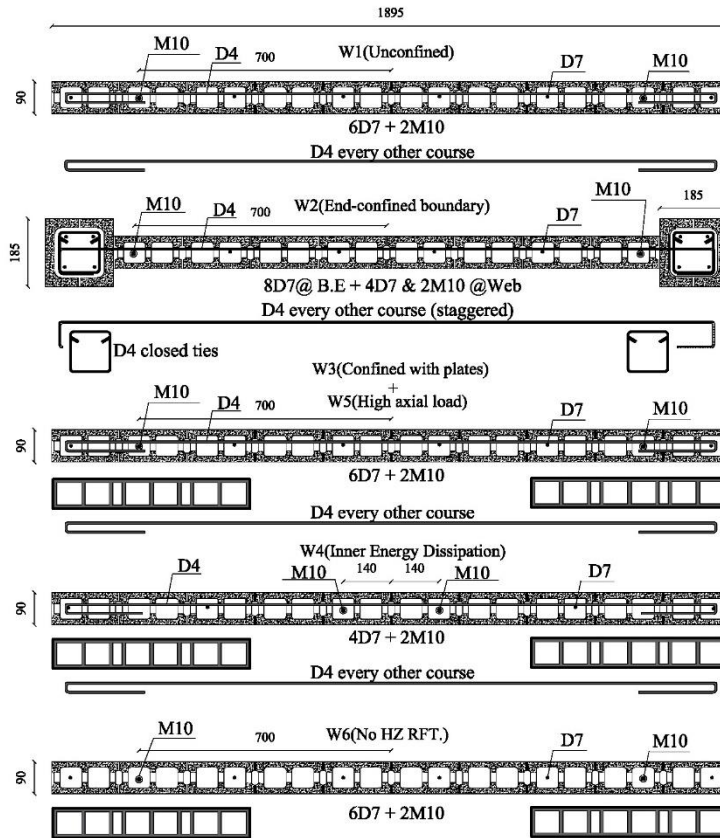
ED-CRMWs cross-section and reinforcement details (all dimensions are in mm).
